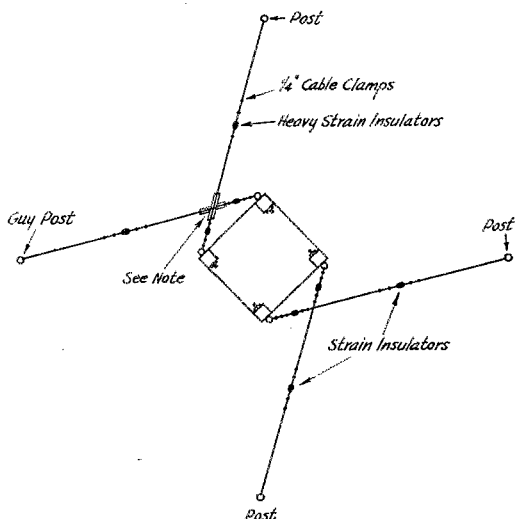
TOP PLAN SHOWING THE ARRANGEMENT OF GUYS
